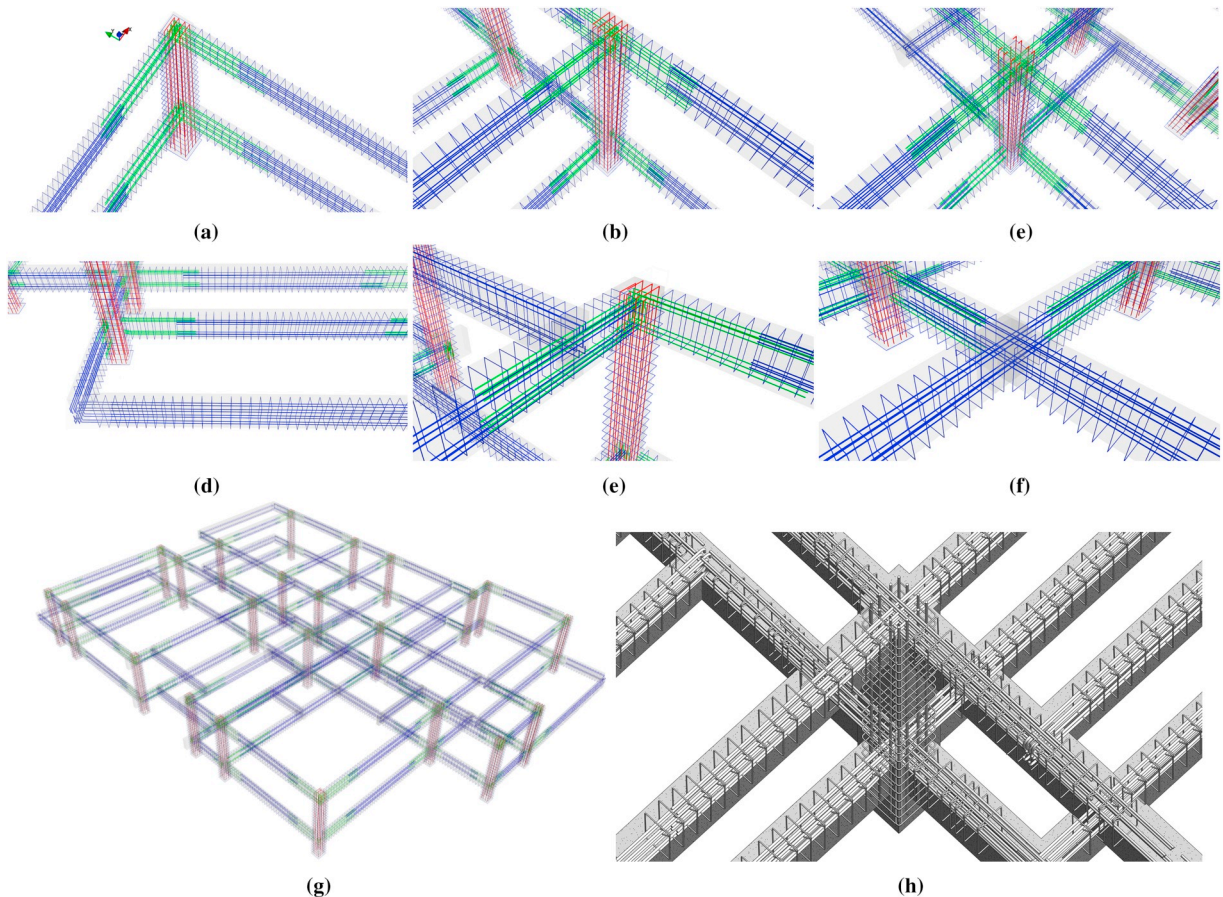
3D BIM output of the RC beam-column joints based on the MARL system: (a) L beam-column joint; (b) T beam-column joint; (c) + beam-column joint; (d) L beam-beam joint; (e) T beam-beam joint and (f) + beam-beam joint.
